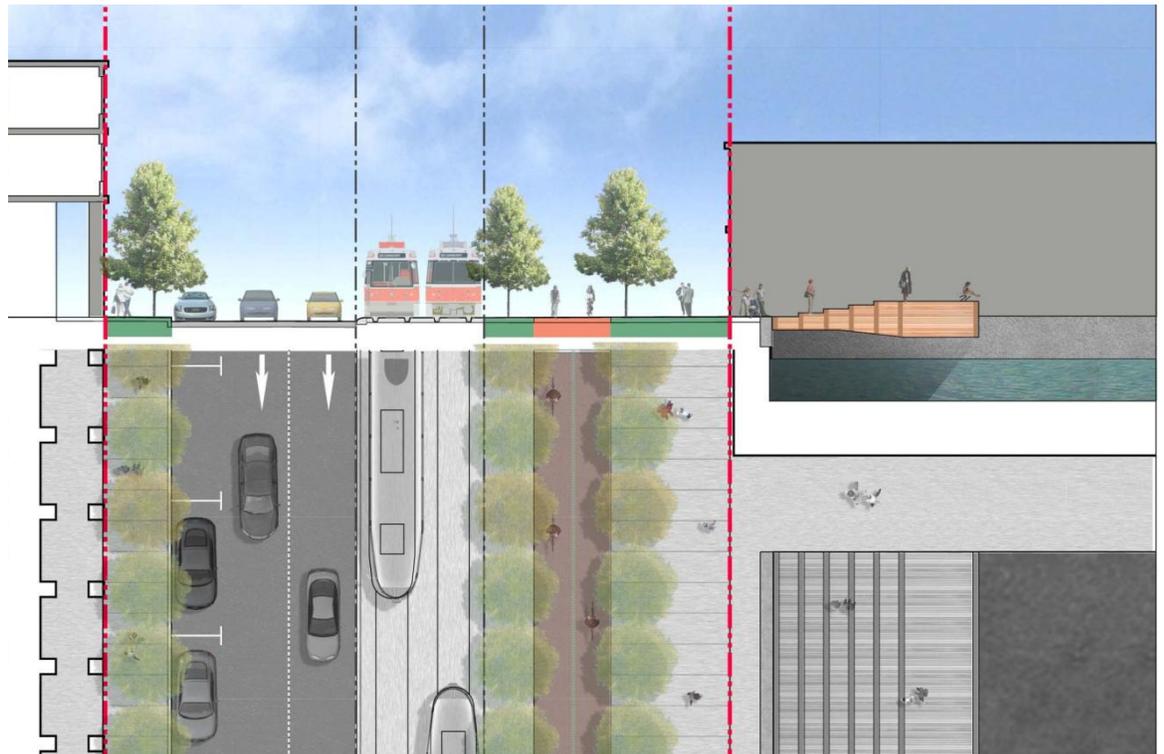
Typical Section and Plan of Alternative 3 Centre Transit with Martin Goodman Trail
